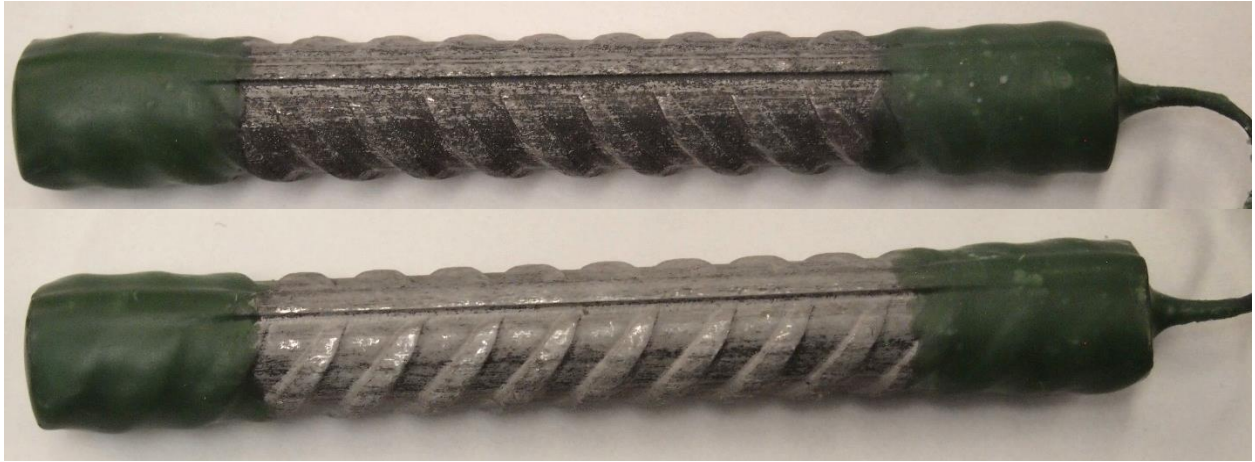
Specimen PK-05 before testing (top) and after testing (bottom)
